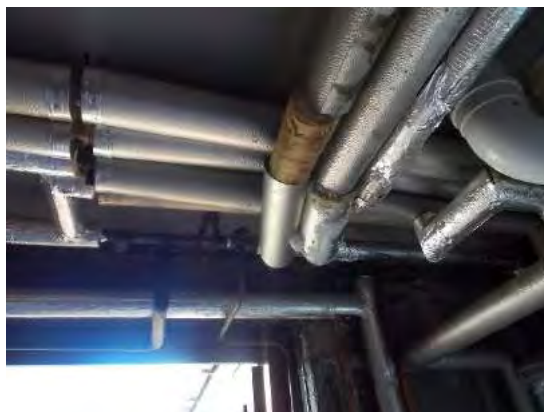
Boiler house Room No 003 – VT heating pump (possibly underfloor heating circuit).
